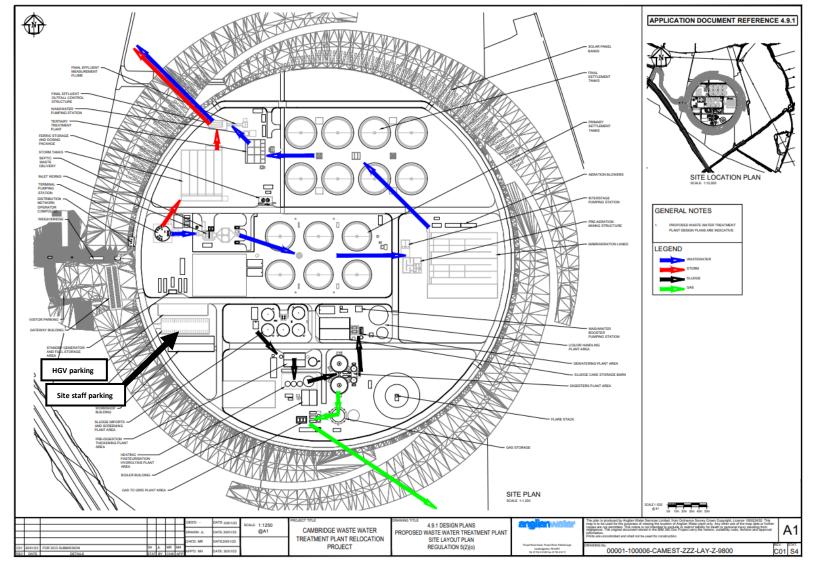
Proposed Waste Water Treatment Plant Layout Plan
